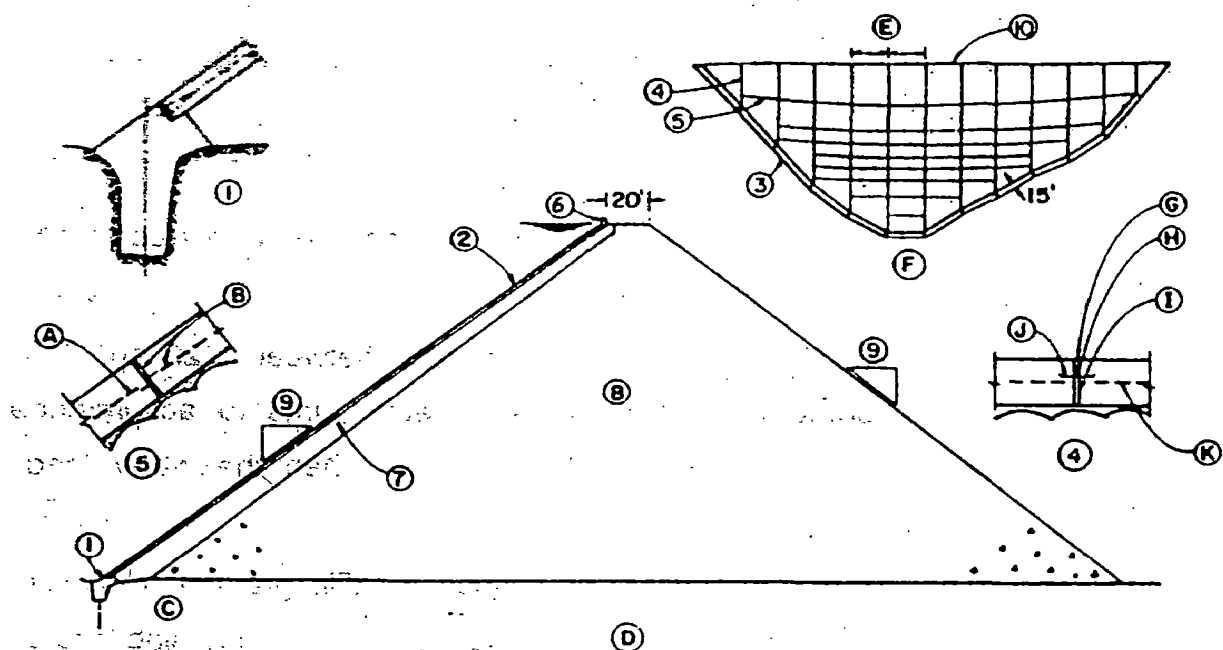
Feature of early concrete face rockfill dam design (ICOLD 1989a). (1) Cut-off trench, (2) Concrete face, (3) Toe slab, (4) Vertical joint, (5) Horizontal joint, (6) Parapet, (7) Crane-placed large rock, (8) Dumped rockfill, (9) Slope, (10) Curved axis. (A) Reinforcement, (B) 1.9 cm redwood filler and Z waterstop, (C) Curtain grouting, (D) Cross section of dam, (E) 18 m (60 feet), (F) Elevation of face, (G) Mastic, (H) Premolded asphalt, (I) Compressible joint filler, (J) U copper, (K) Reinforcement. (at (7))
